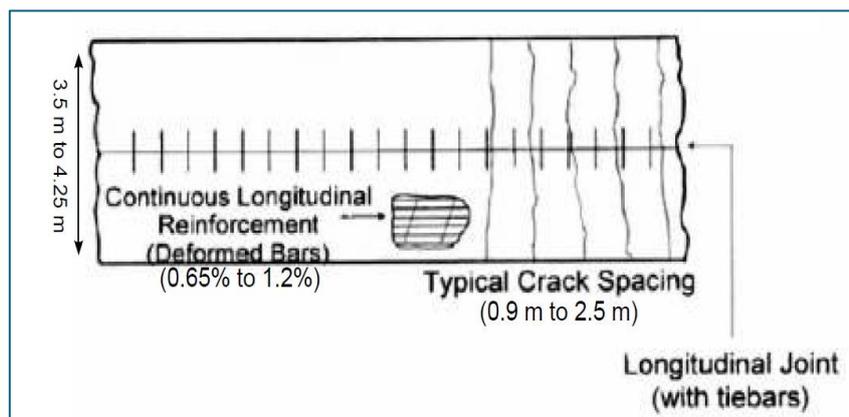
Plan view of Continuously Reinforced Concrete Pavement (CRCP)
